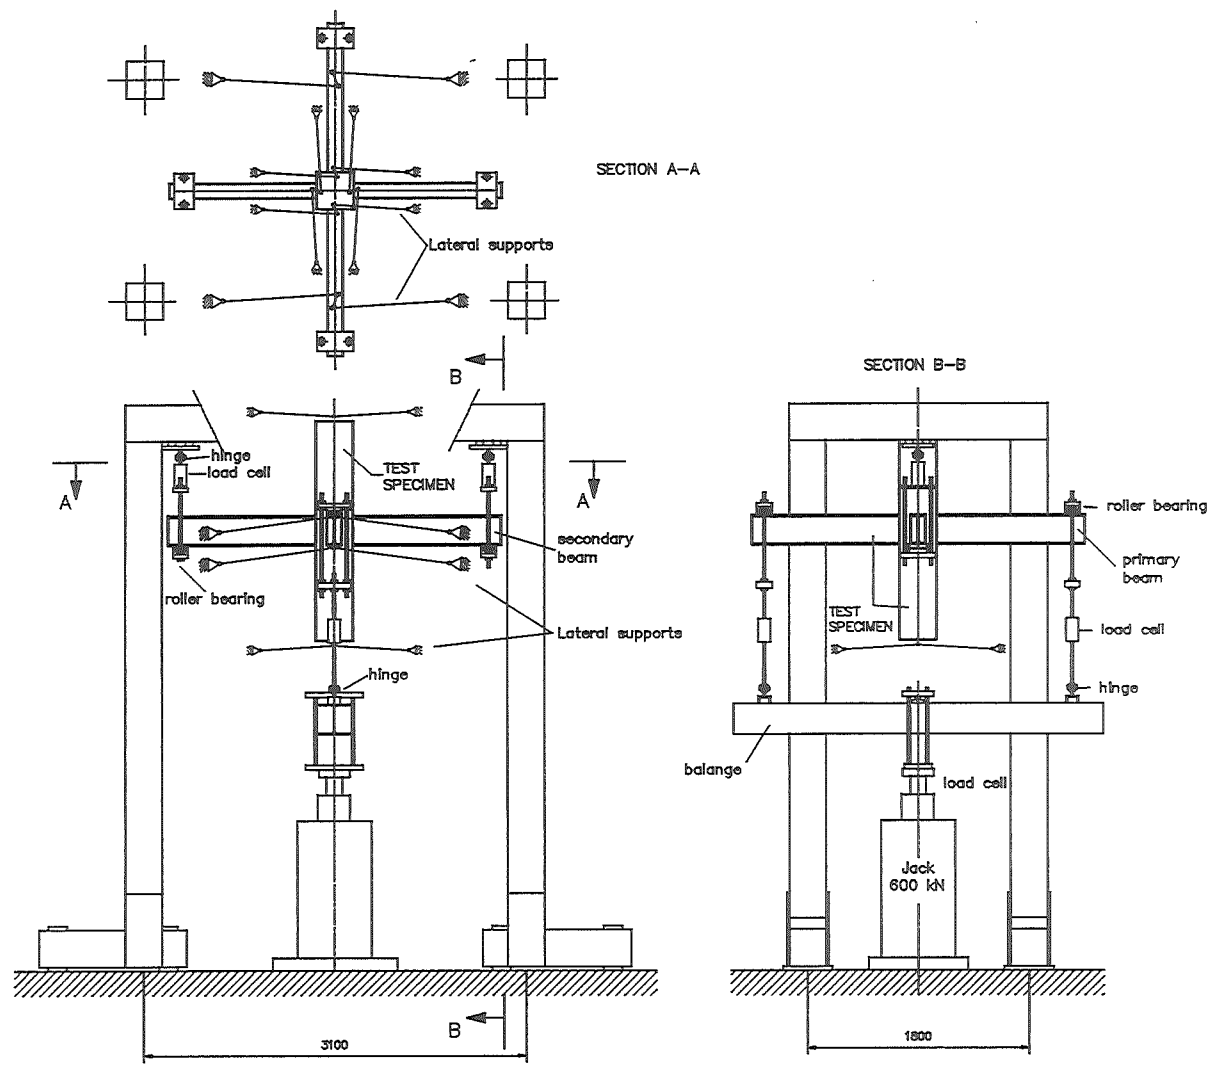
Test rig for specimens 3C3 and 3R3 having CHS or RHS columns with primary beams under hogging moments and secondary beams under sagging moments
